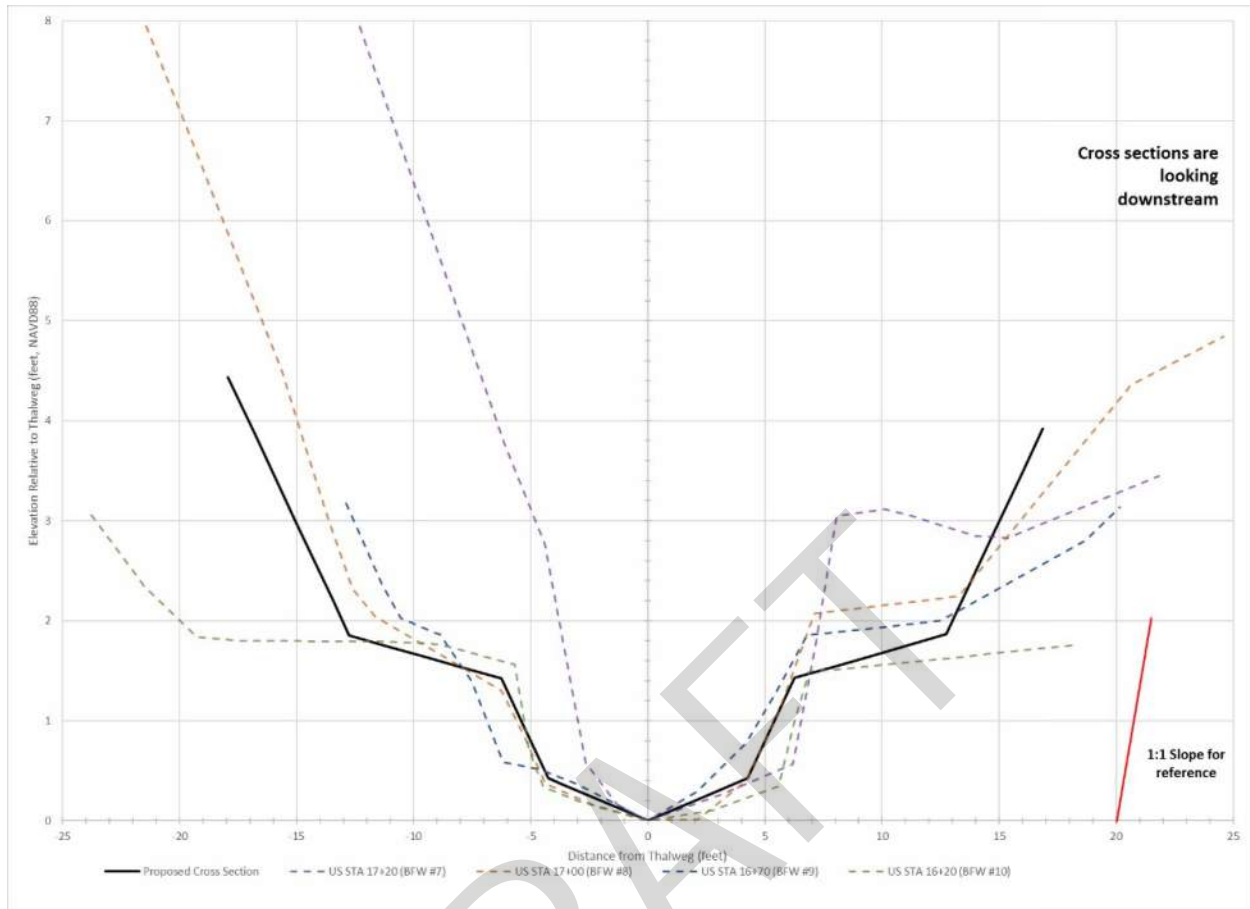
Proposed cross section superimposed with existing survey cross sections (cross sections looking downstream)
